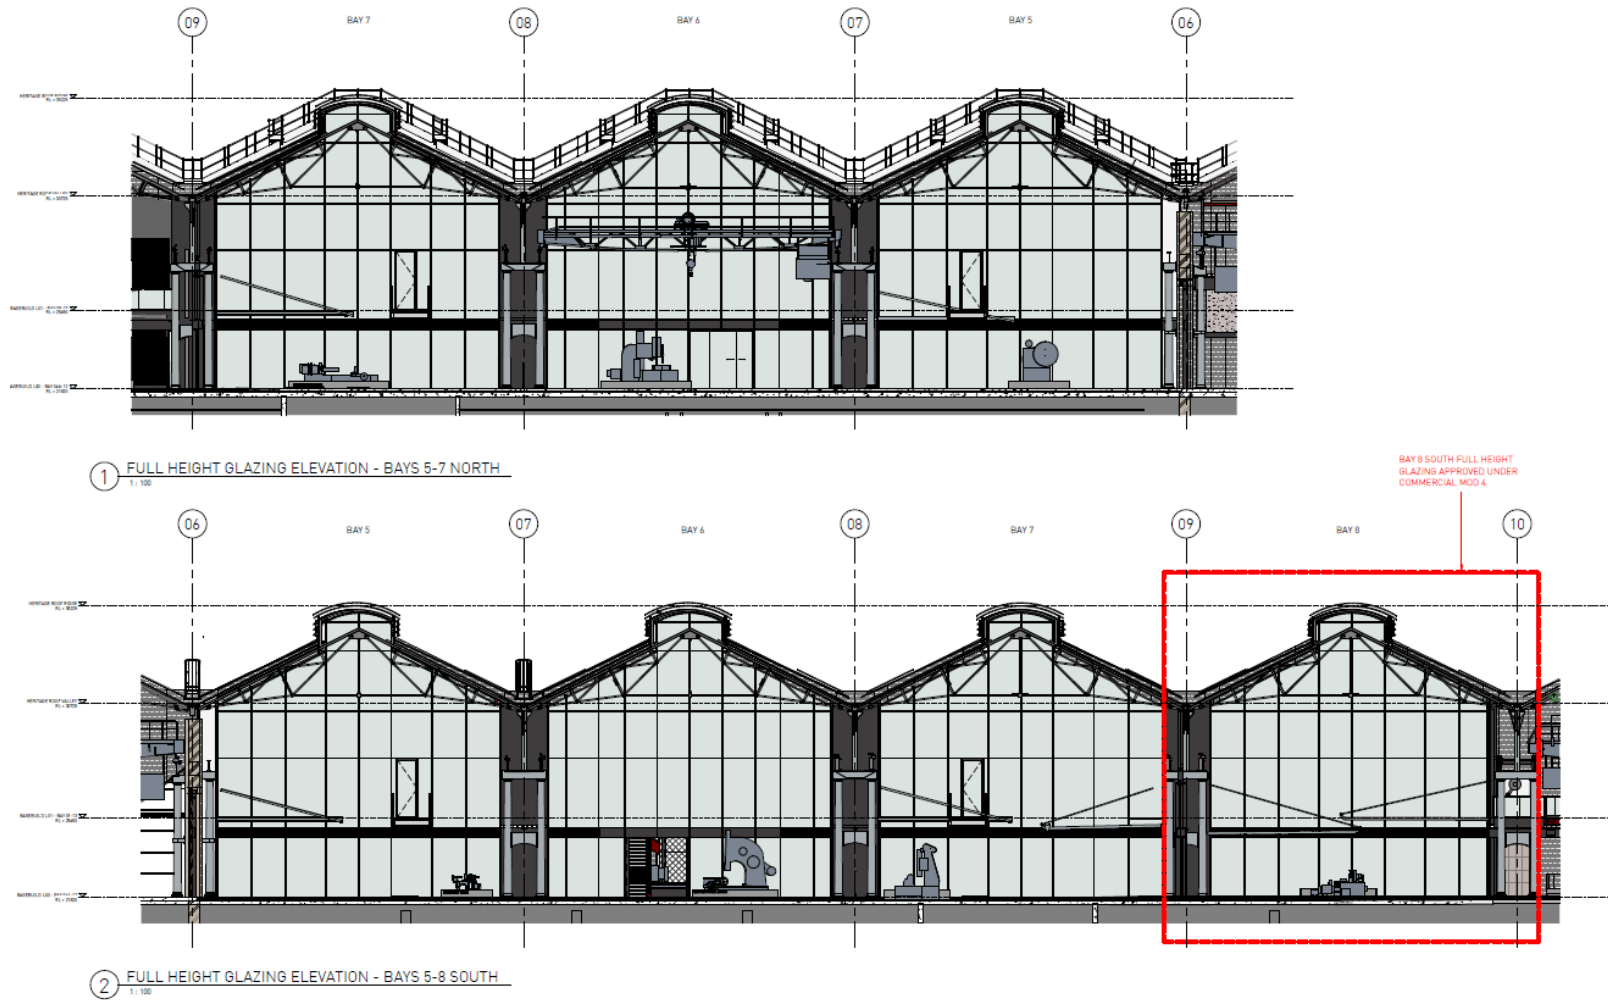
Proposed Elevations Bays 5-8 (North and South) (Source: Sissons, 2020)
